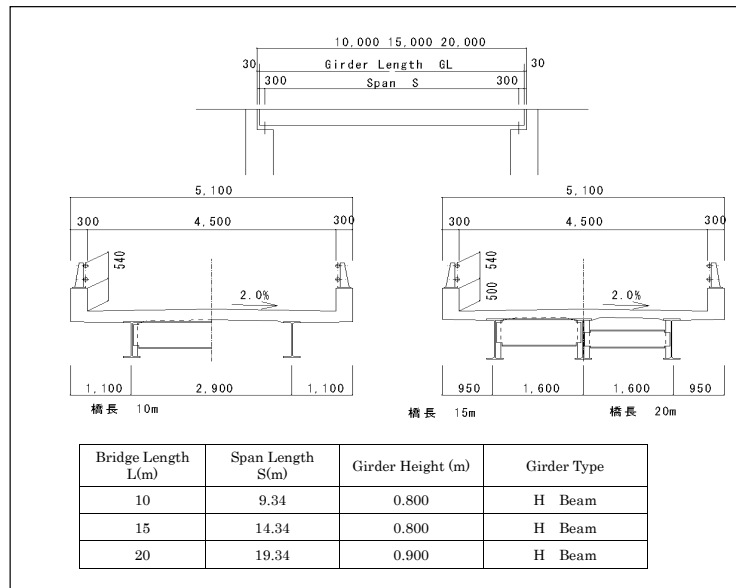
General Drawing of H-Type Steel Girder Bridge for Steel Girder Procurement Type
